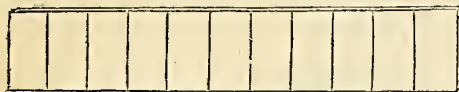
SIDE OF BOX FOR CONCRETE WALL.
